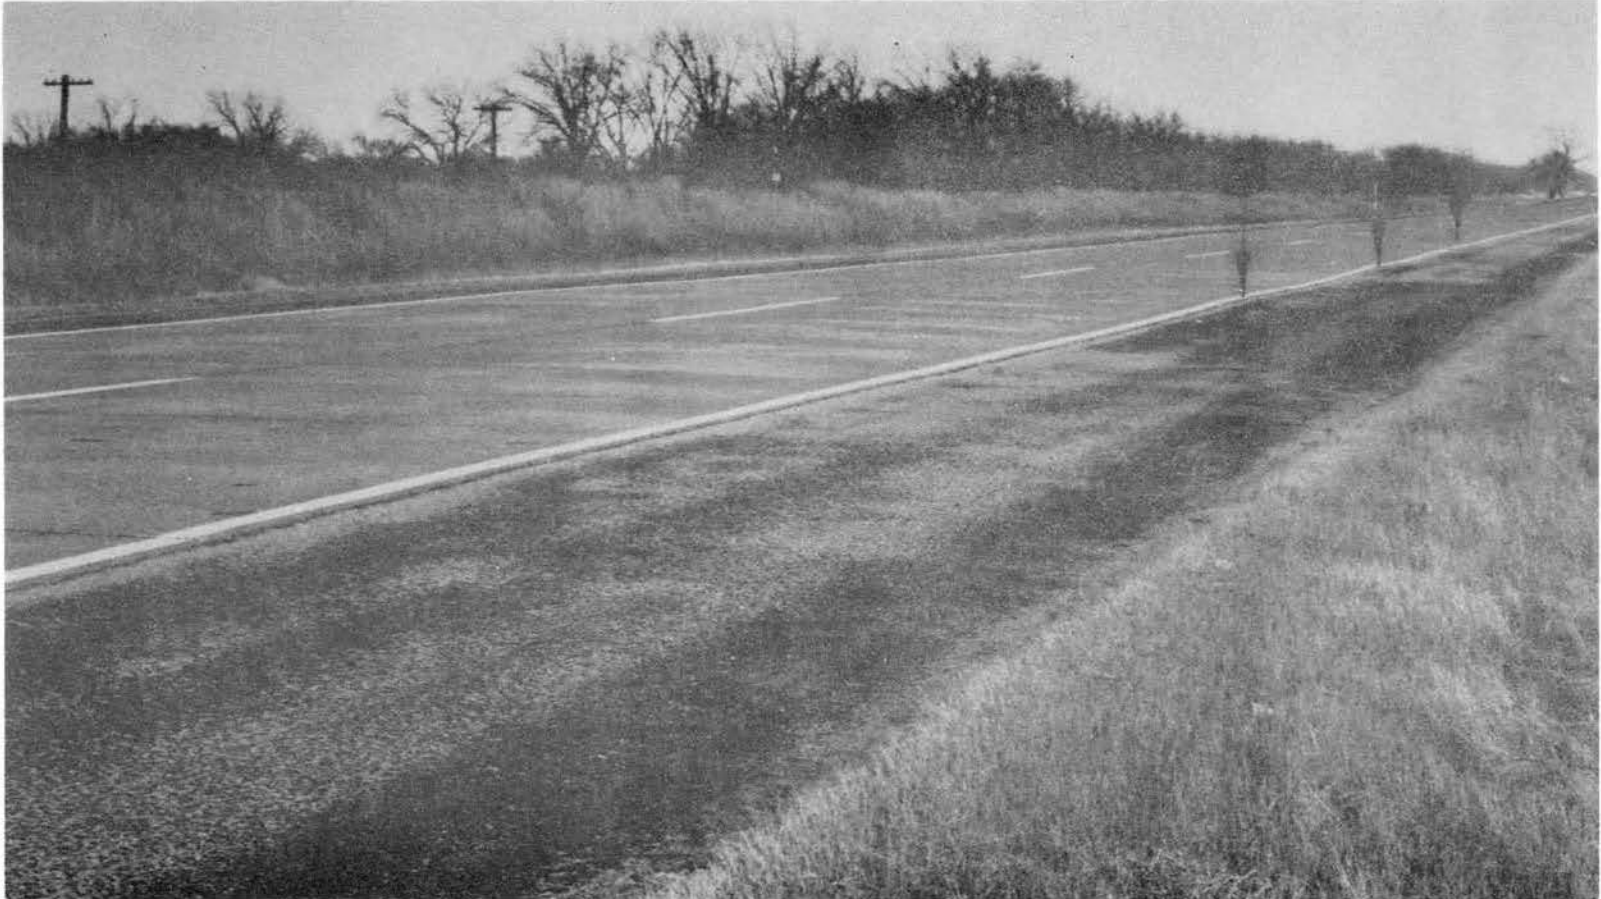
Ripples in Pavement Edge at Site No. 29
